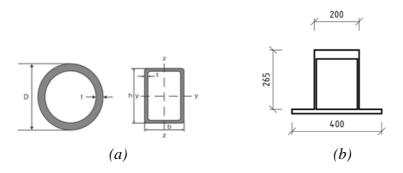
Different steel profiles used in the reference building for the columns and the beams (a)Steel columns (b) Steel beam
